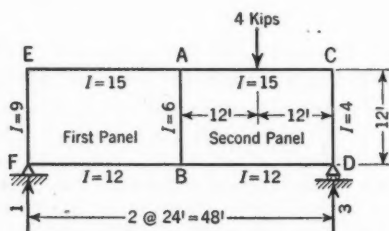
DOUBLE-PANEL OPEN-WEB TRUSS
